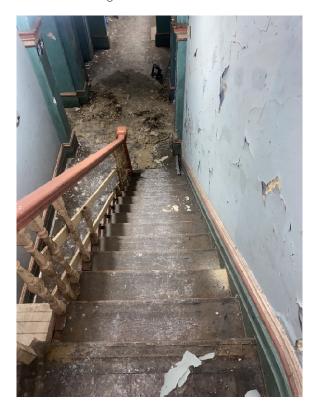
View downstairs to ground floor from the Room F15 landing  $\,$
